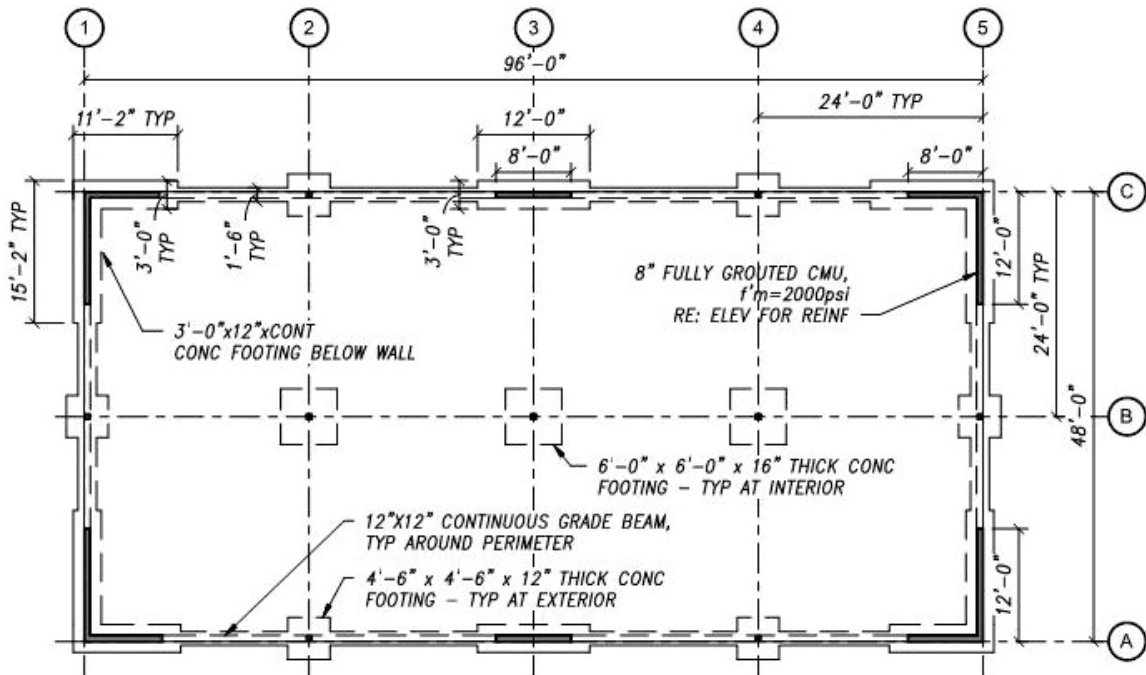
Two-story commercial building foundation plan: COM2, COM5, COM8.
